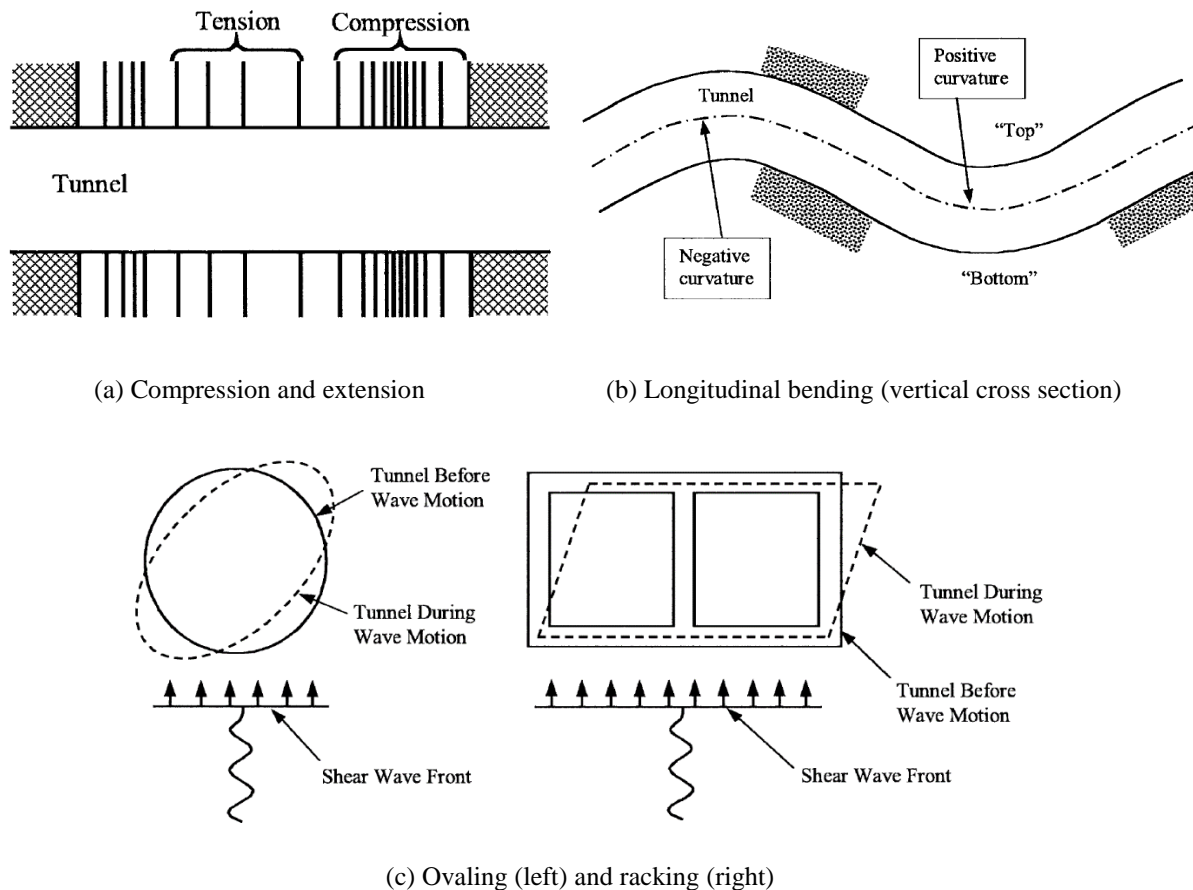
Three major deformation modes of underground structures (Owen and Scholl, 1981)
